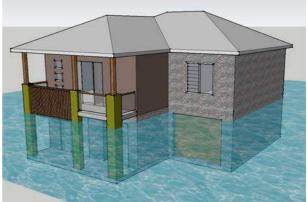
Typical elevations of building with non-habitable floor space below the FPL.
